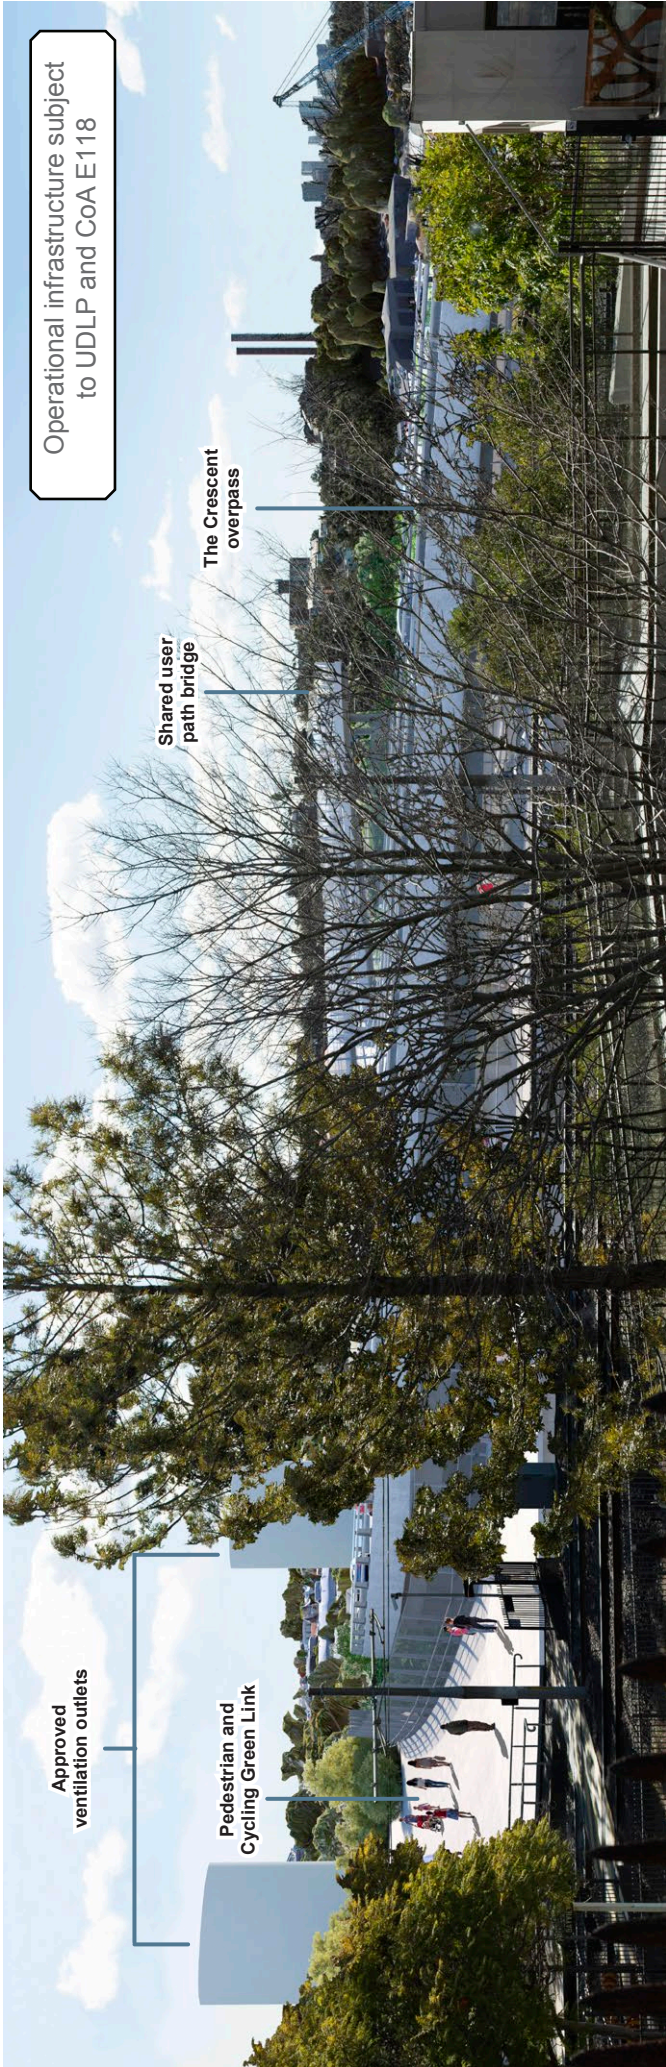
Photomontage 5: Indicative view west from the corner of The Crescent and James Craig Road (with project)
